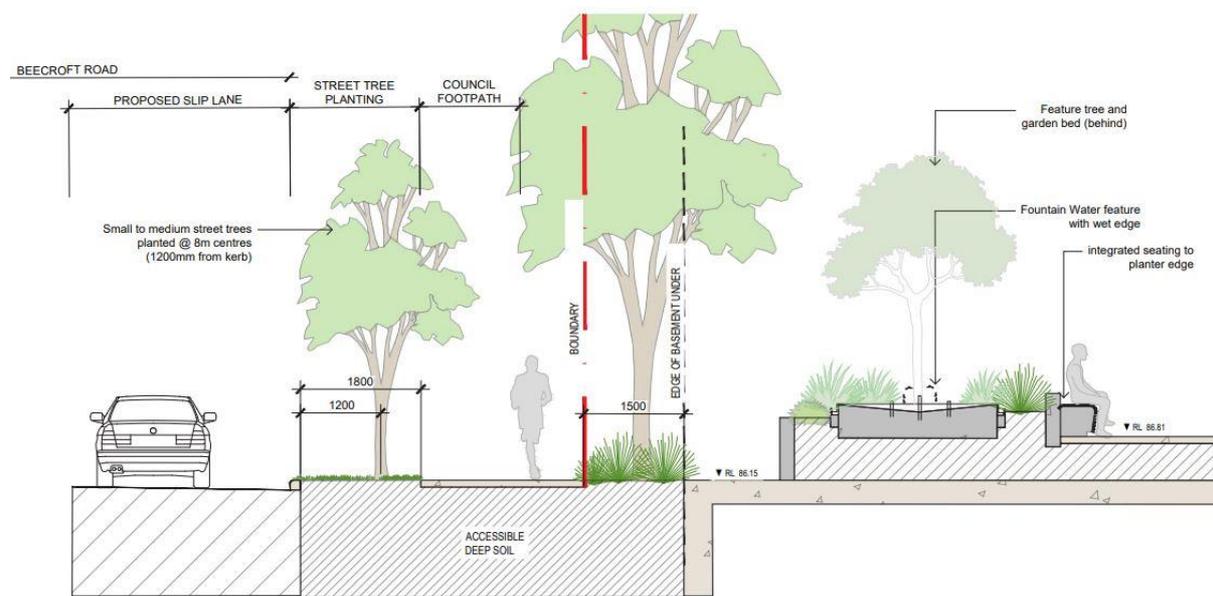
| Section of street tree and on-site tree planting along Beecroft Rd (Source: Applicant's RTS)
